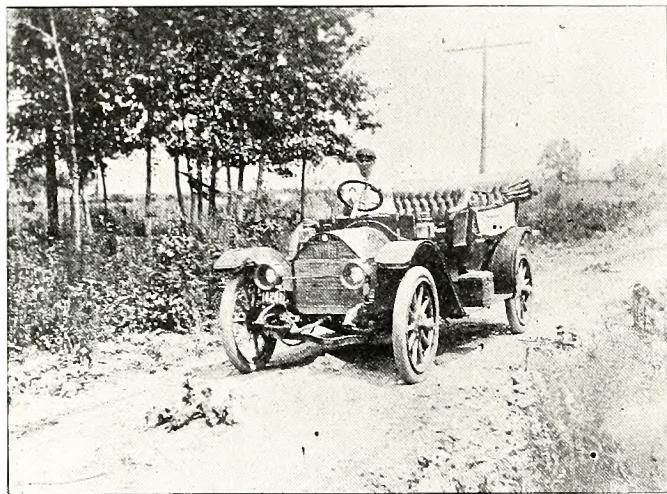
A road where surface contains a great many stumps. Such a road cannot be maintained properly.
